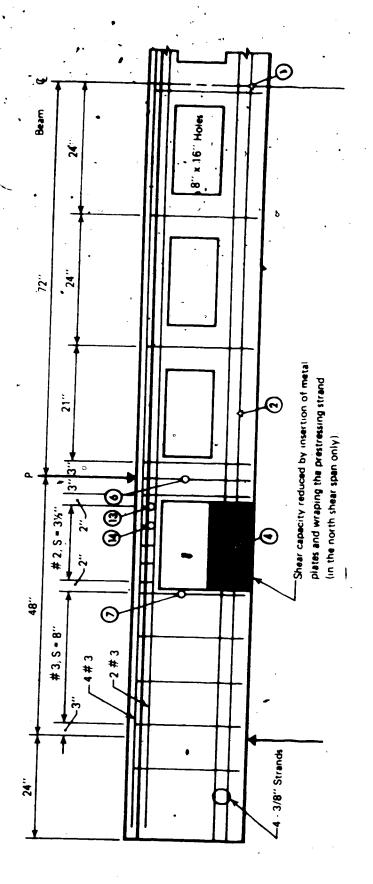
Reinforcement Details and Strain Gage Locations for Beam 5-16-4
